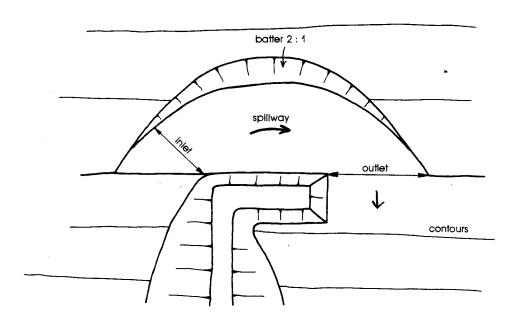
Plan View of Spillway Layout with Wing Wall (Nelson)
